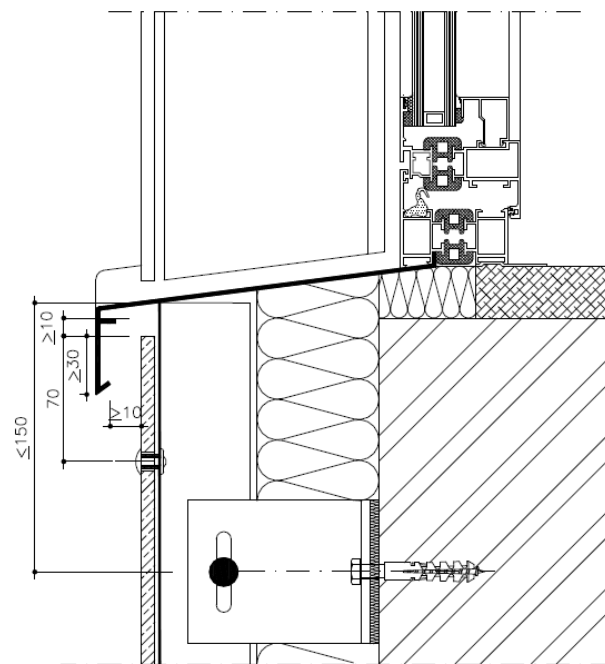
Rain screen section at window sill (image property of American Fiber Cement)
